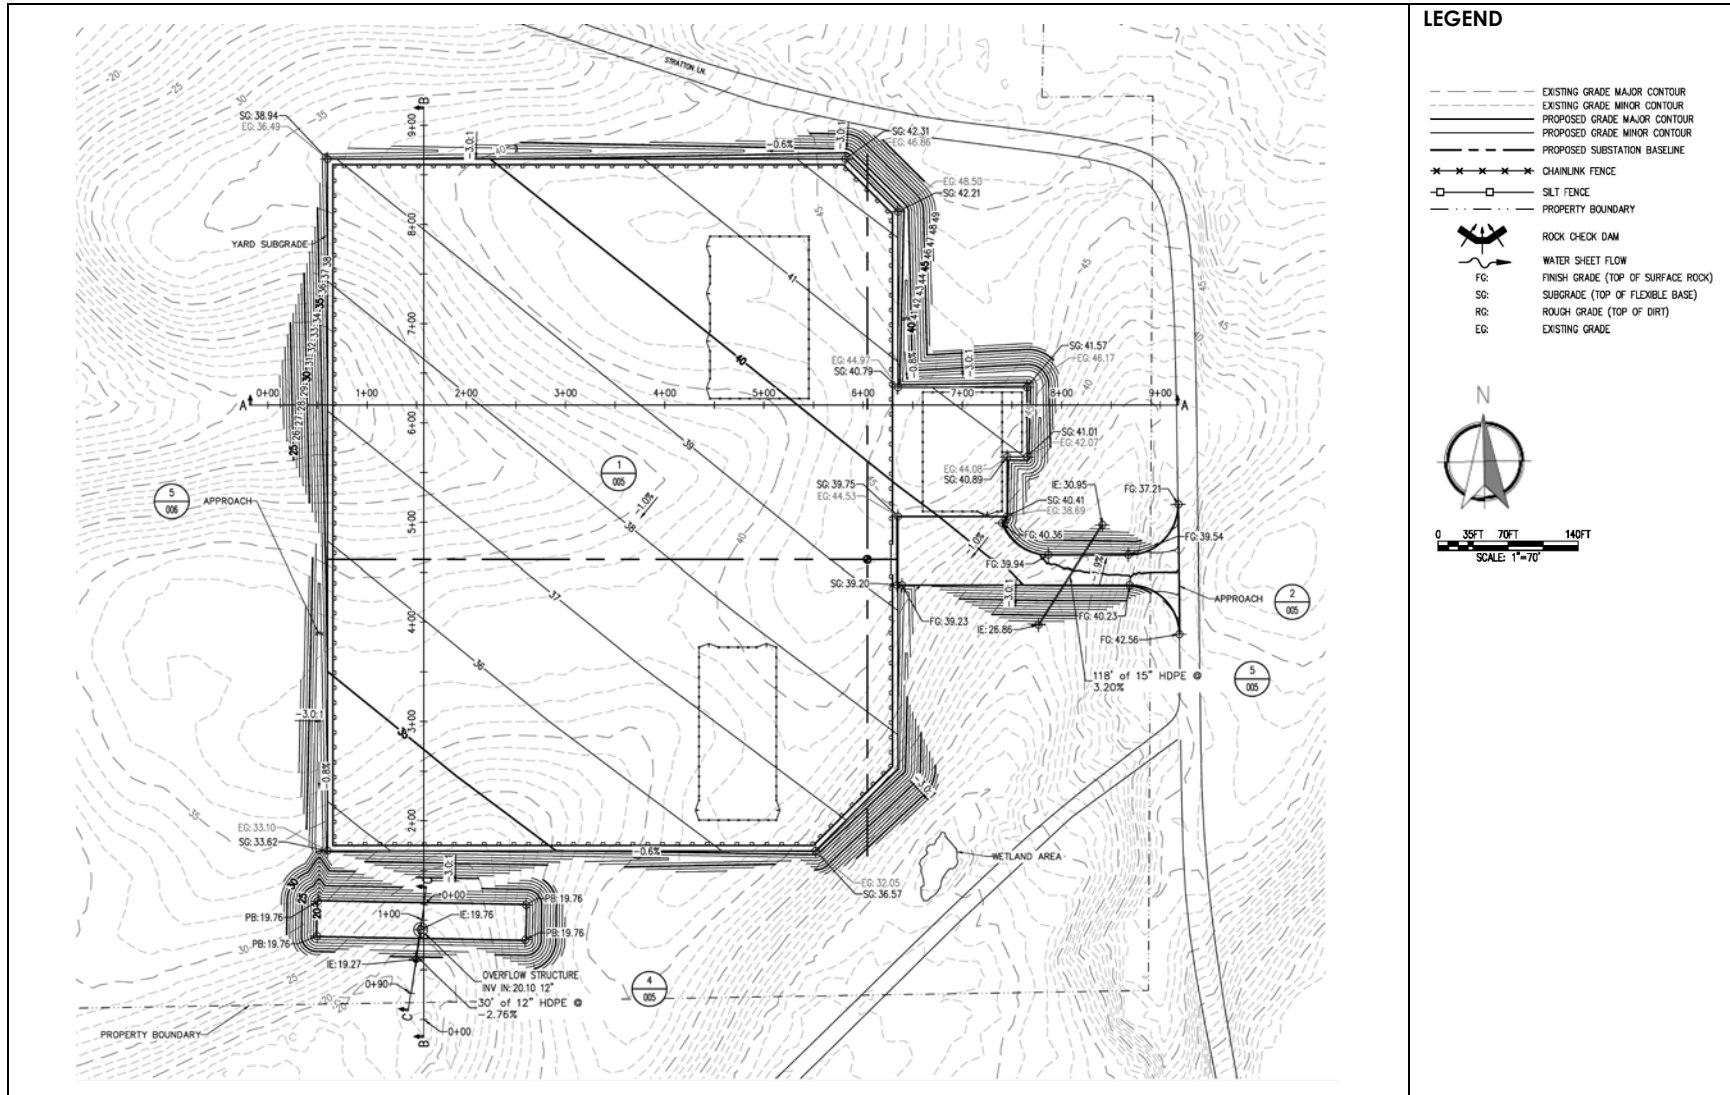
Proposed LSPGC Collinsville Substation General Arrangement
